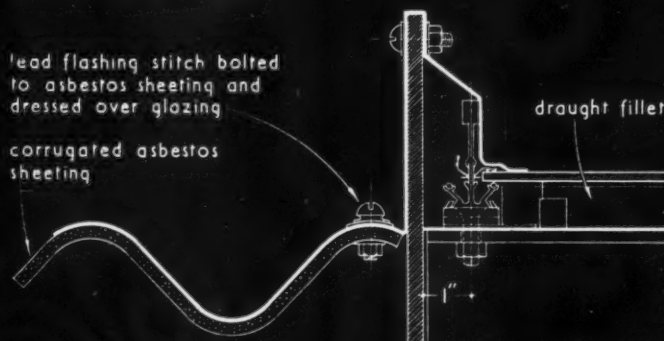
DETAIL OF GLAZED PANEL IN STEEL ROOF OF NORMAL PITCH.
